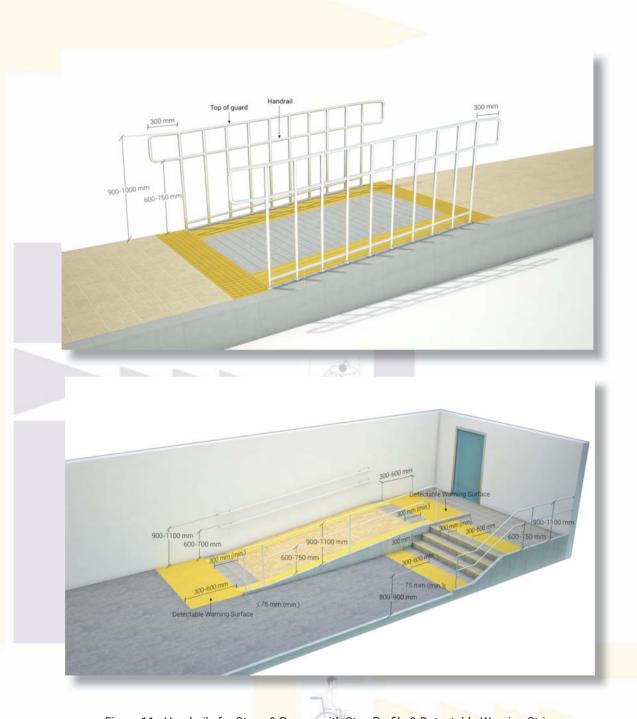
Handrails for Steps & Ramps with Step Profile & Detectable Warning Strips
